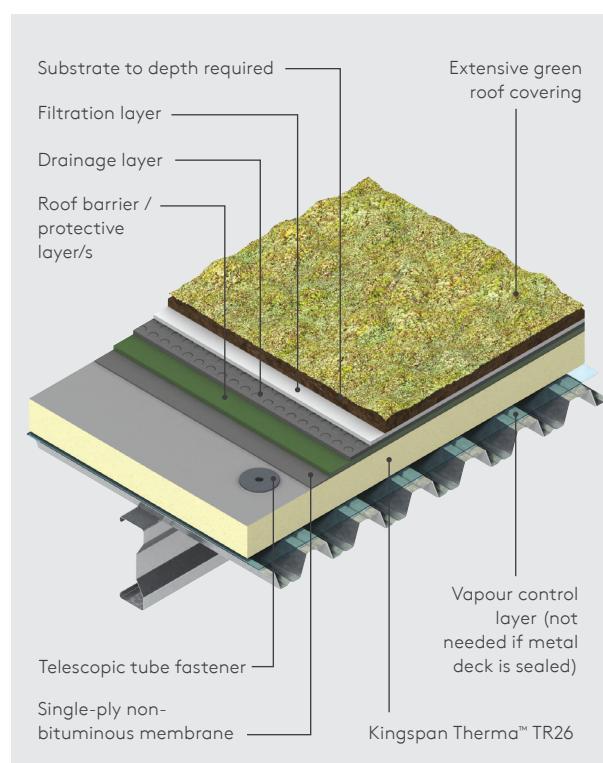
Kingspan Therma™ TR26 in an Extensive Green Roof Covering – Metal Deck with No Ceiling.
